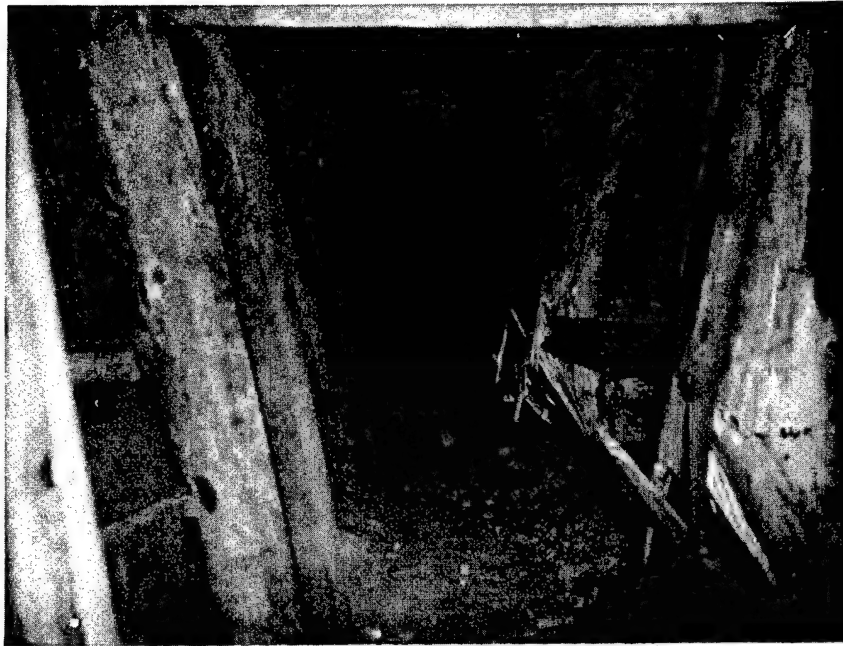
Preshot Timber Failure in Stope Area of Sheelite Mine.
